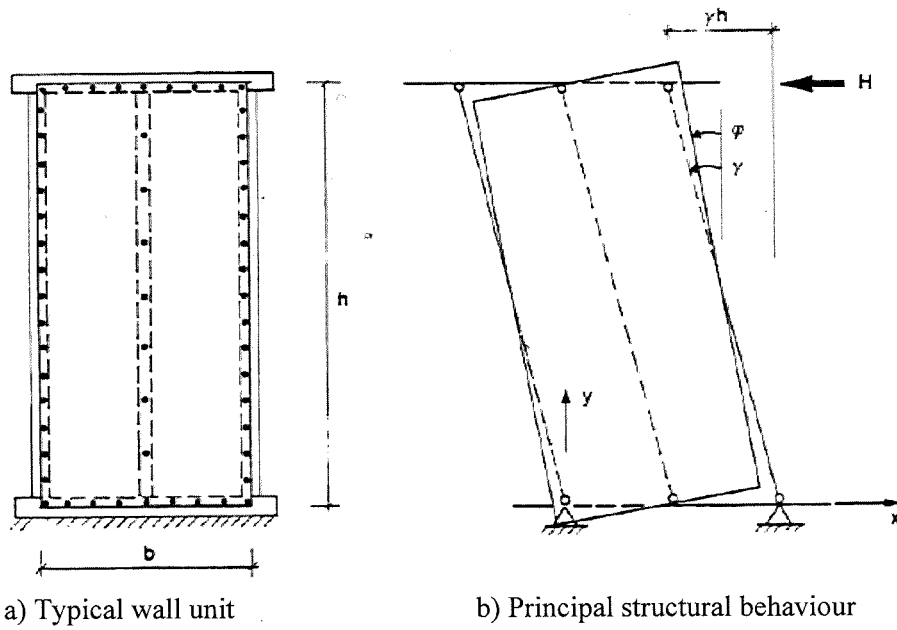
Shear wall and diaphragm action (Prion and Lam, 2003)
